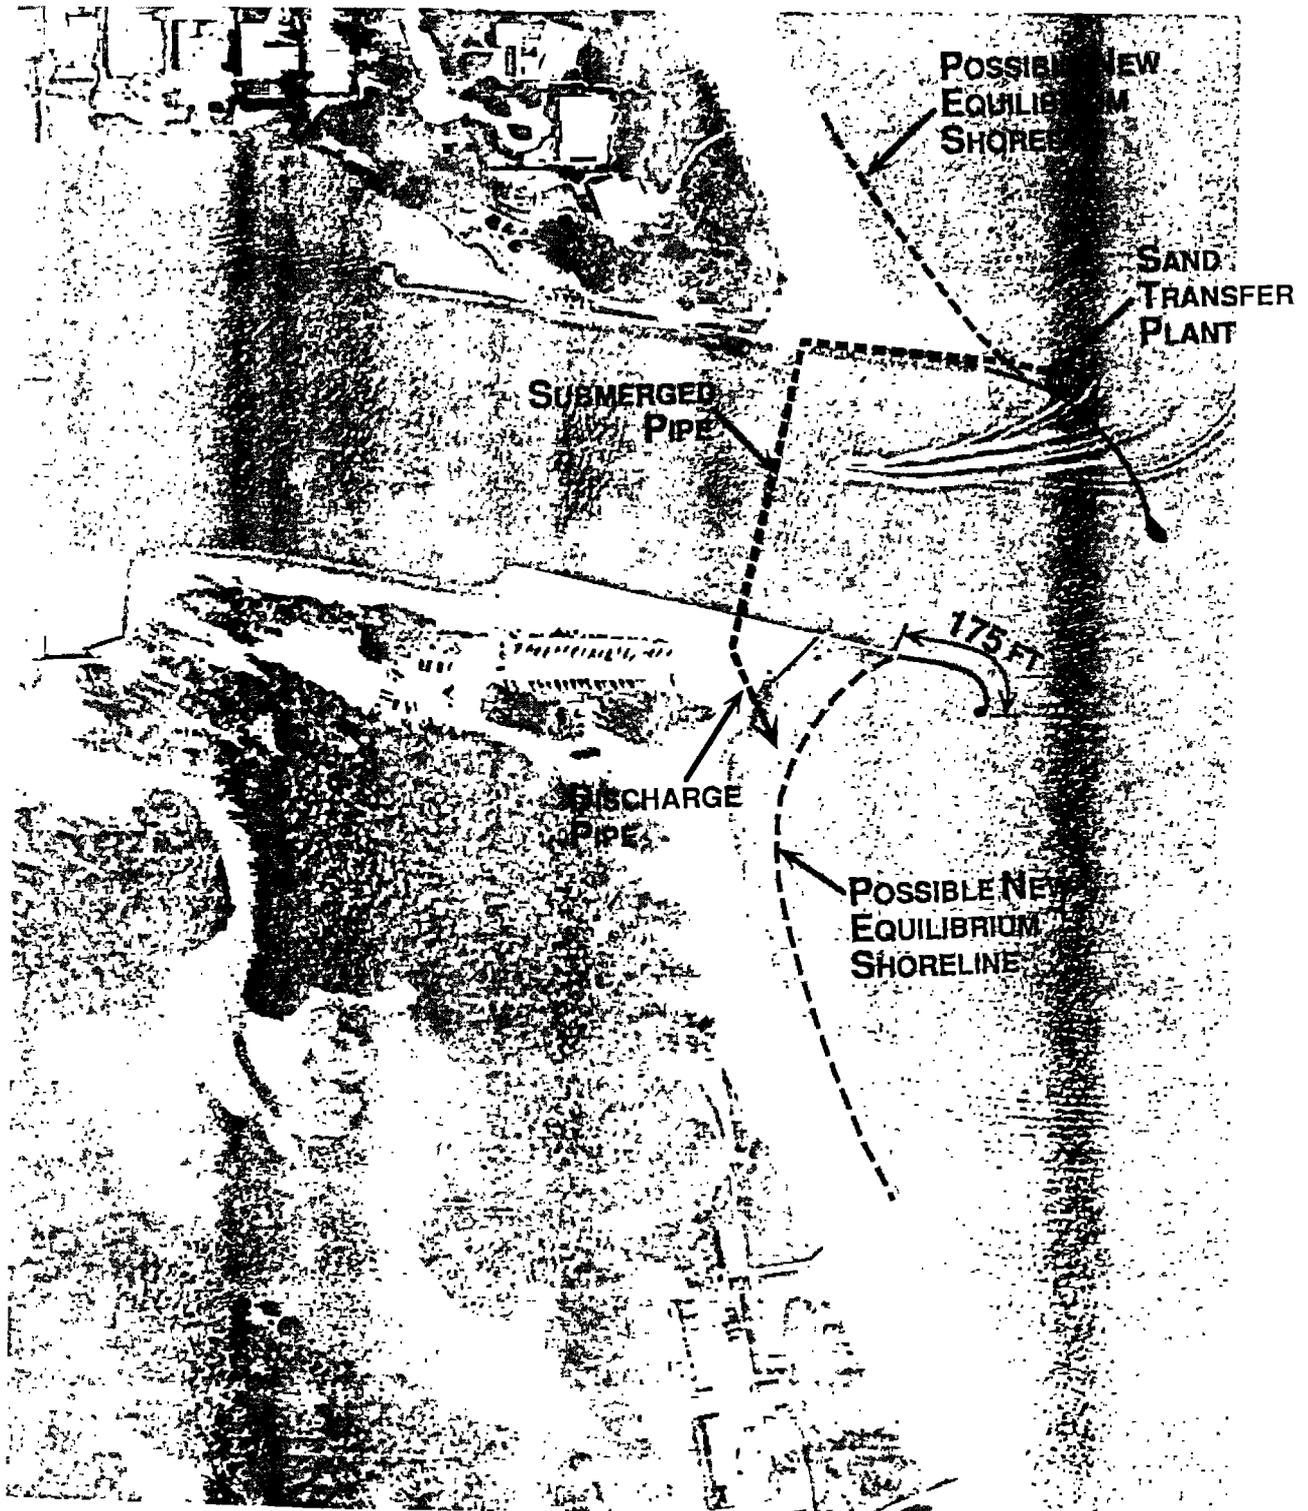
Extended north jetty with a sand bypassing plant.
